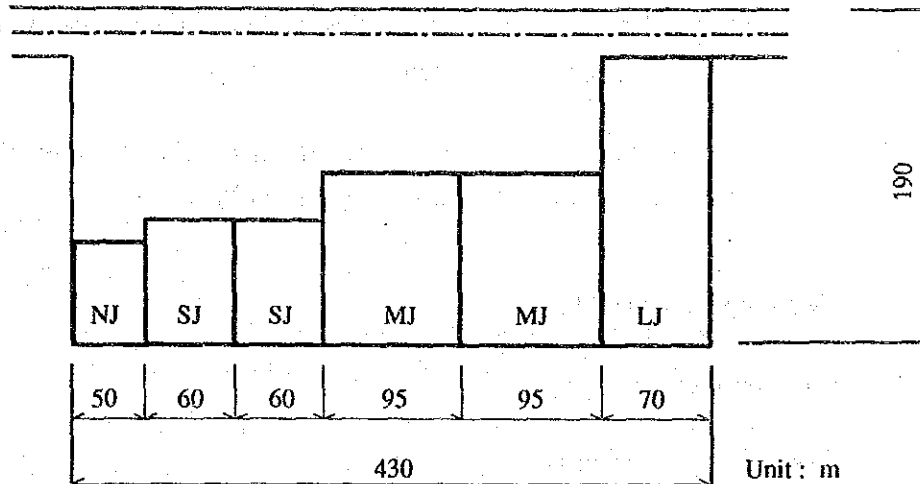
Passenger Terminal Apron Arrangement for Master Plan
